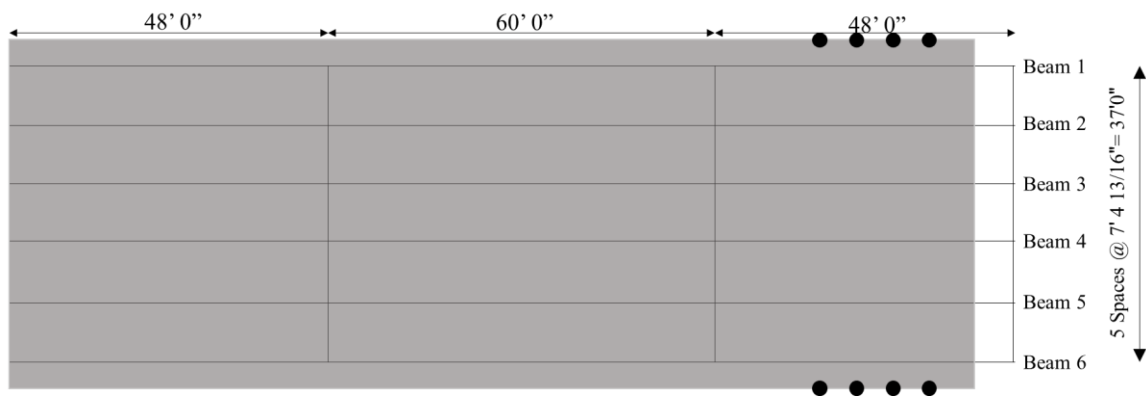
Span 3 vehicle and wet concrete load for 160 ft Standard Bridge
